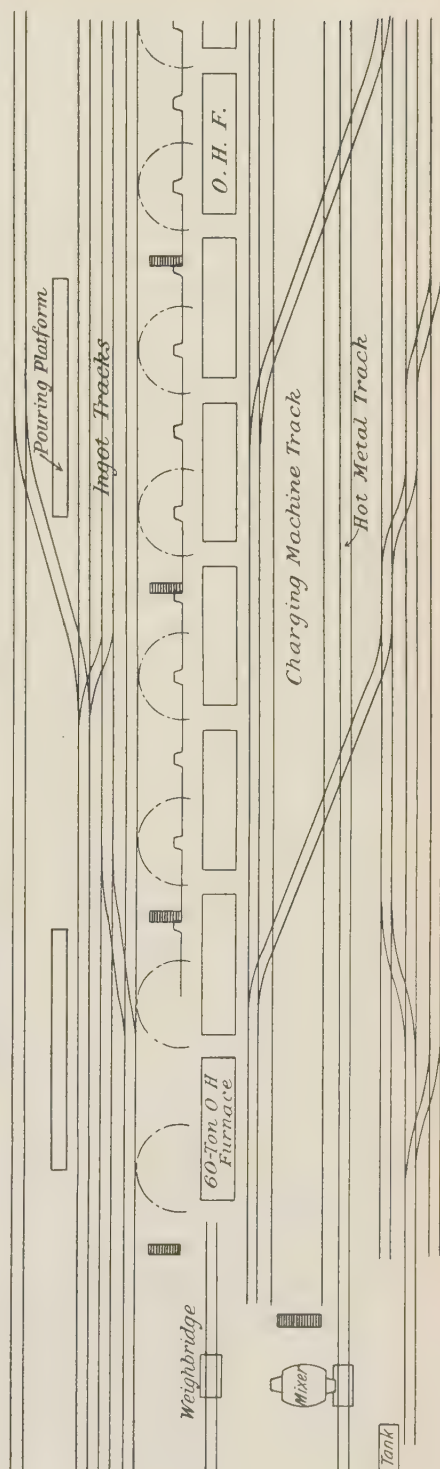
Gary Works, Section through Open-hearth Furnace Plant.
